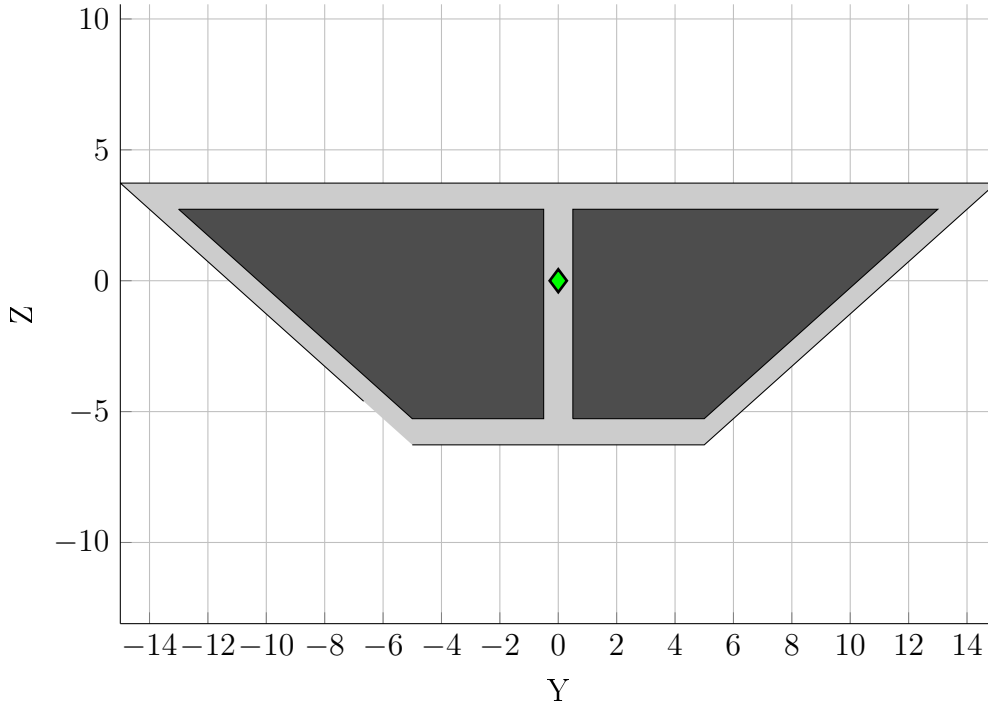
Section 2 - Trapezoidal section used in the benchmarks
